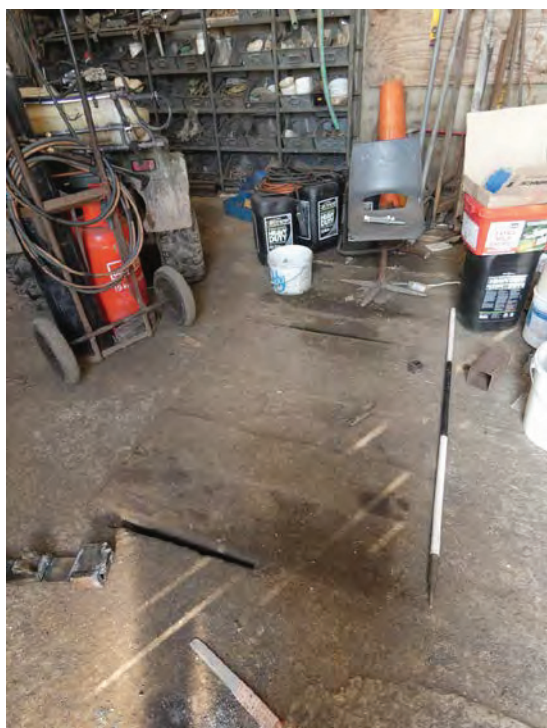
(left): Inspection hatch in the floor of Room G1, viewed from the south-east
